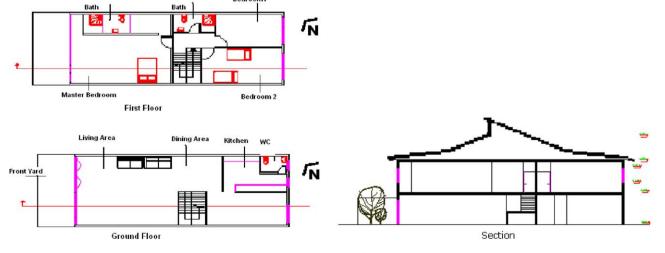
Floors plans and longitudinal section of the case study terrace house.
